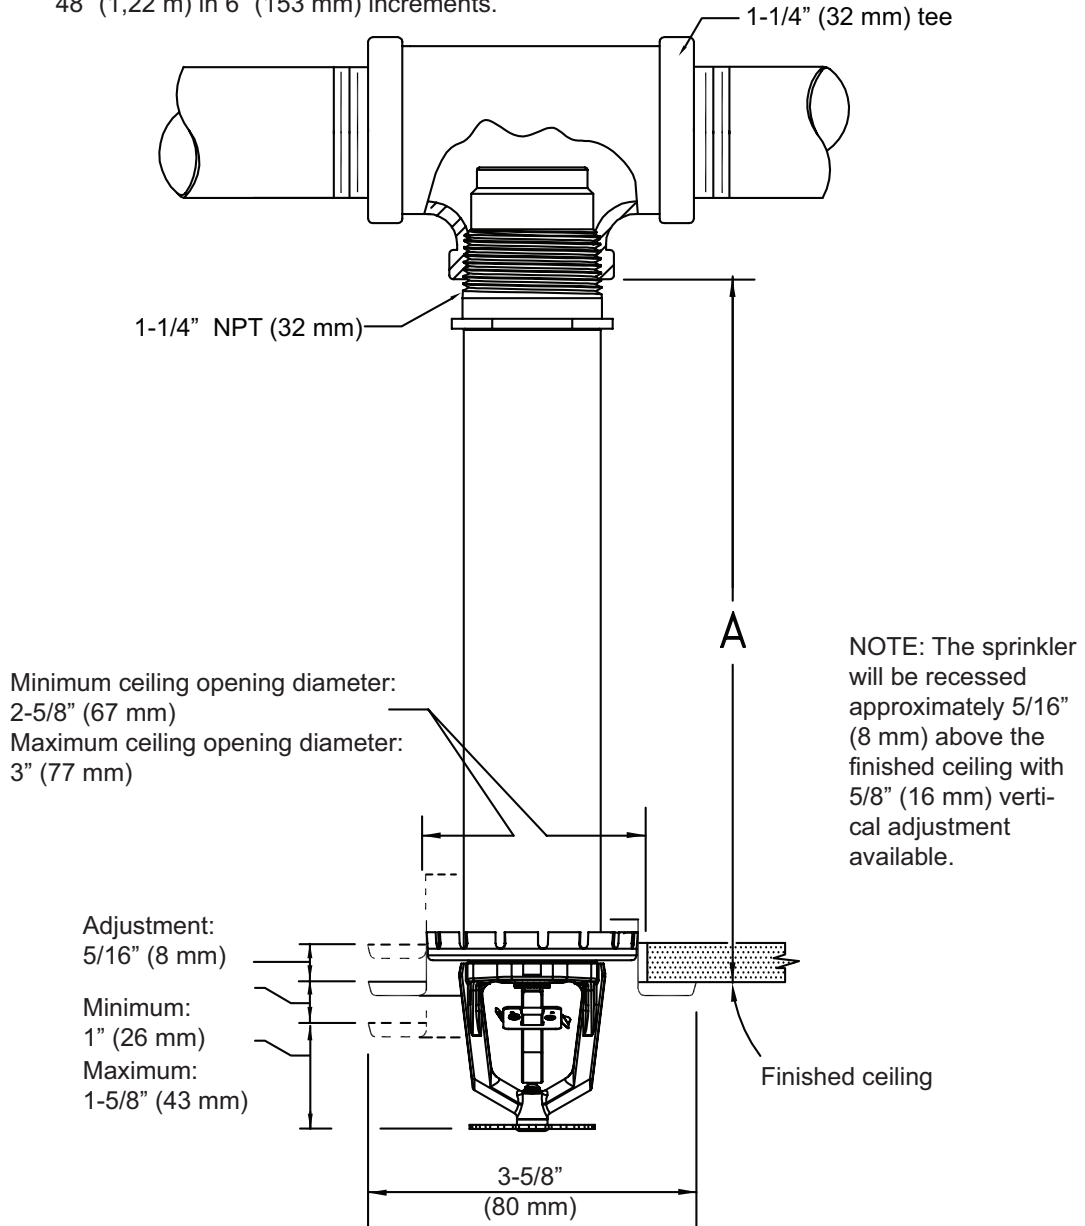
Adjustable Recessed Dry Pendent Sprinkler
